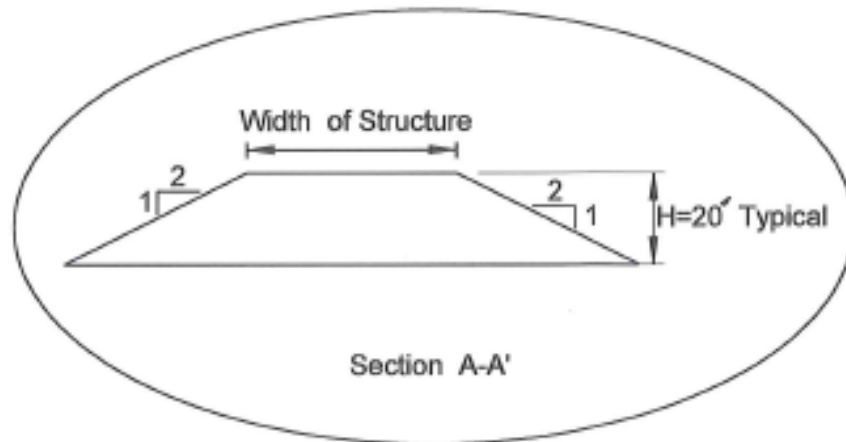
Typical Section of Pre-load for the P-Line Bridge at Sites No.10 and No.11 (width of structure was assumed to be 40 ft).
